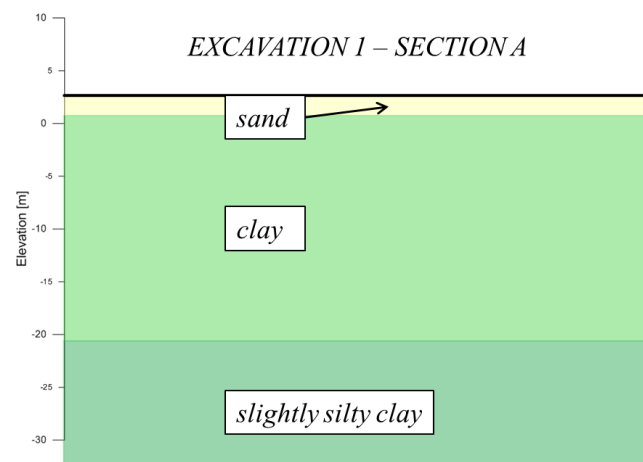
Initial soil profile for Excavation 1, for the preliminary road under the railway bridges.
